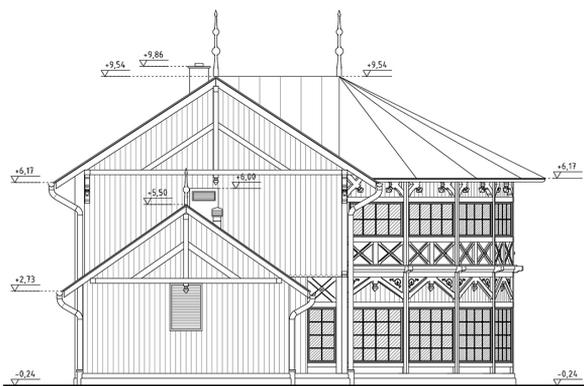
Eastern elevation of the shooting pavilion (Source: PKZ ARKONA Sp. z o. o.)
